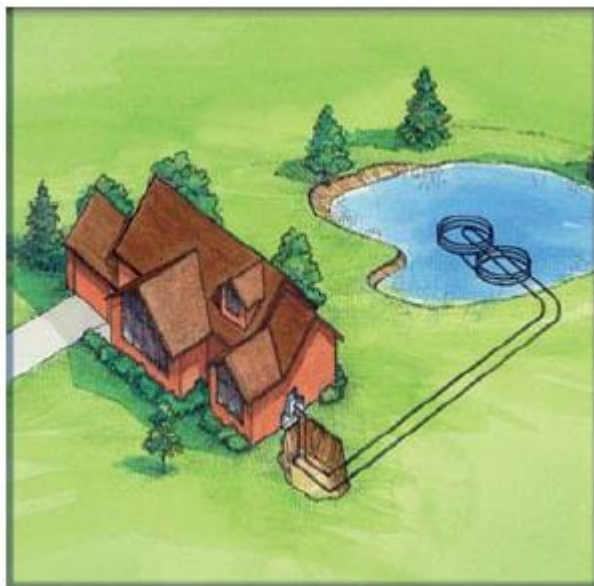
Horizontal pond loop system (Klaassen 2006)
